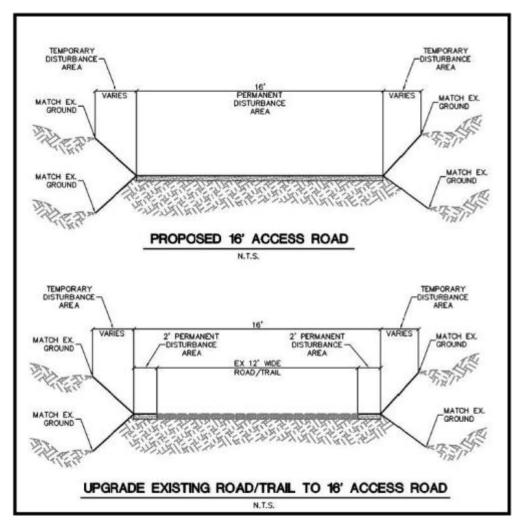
Typical Cross-Sections for Project's 16-Foot-Wide Access Roads
